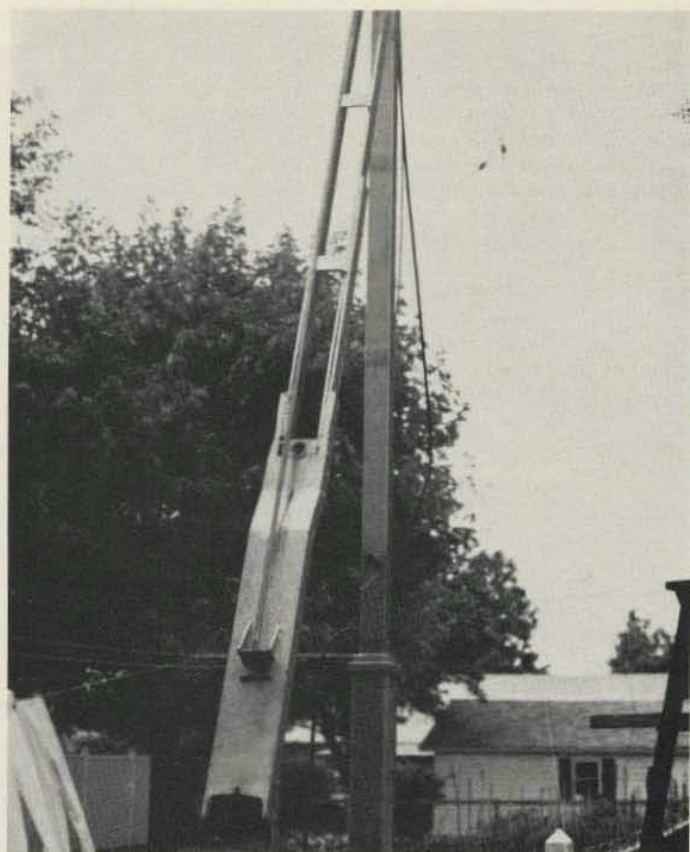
Photo C. View showing 6" channel iron welded to the bottom of tilt-over section to increase fulcrum point.
